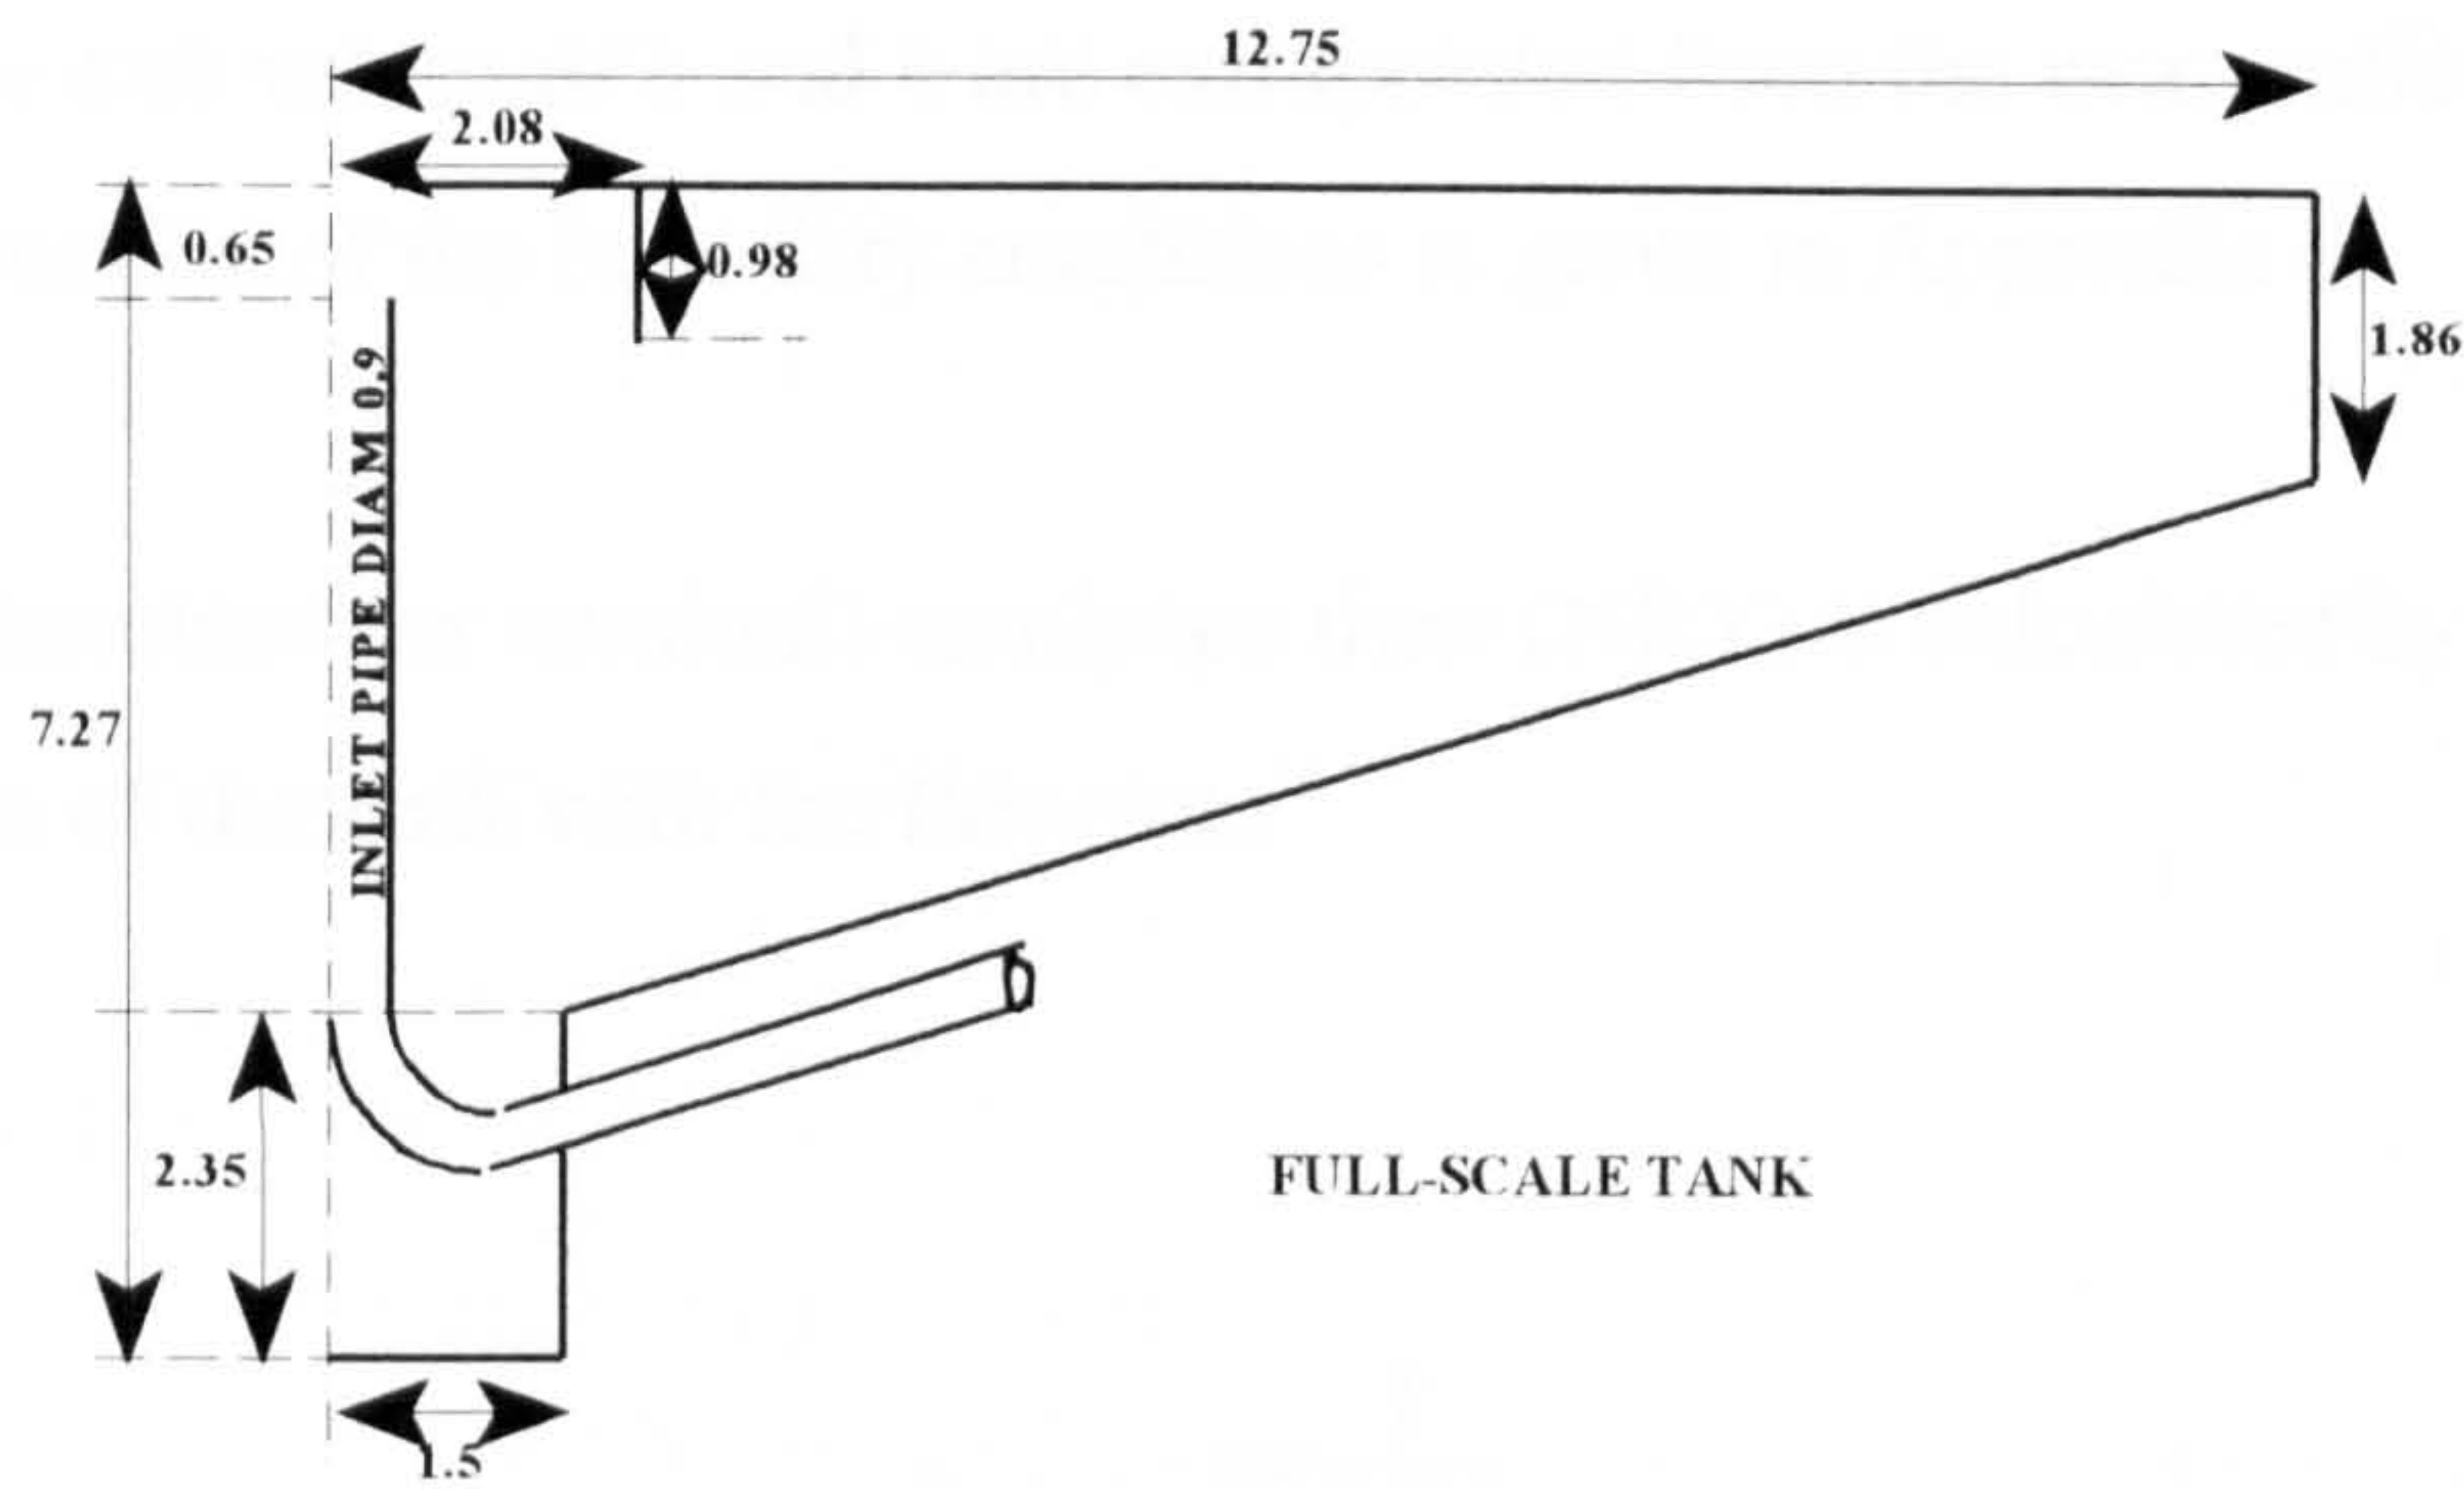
Tank dimensions of the cross-section of the full-scale tank.
